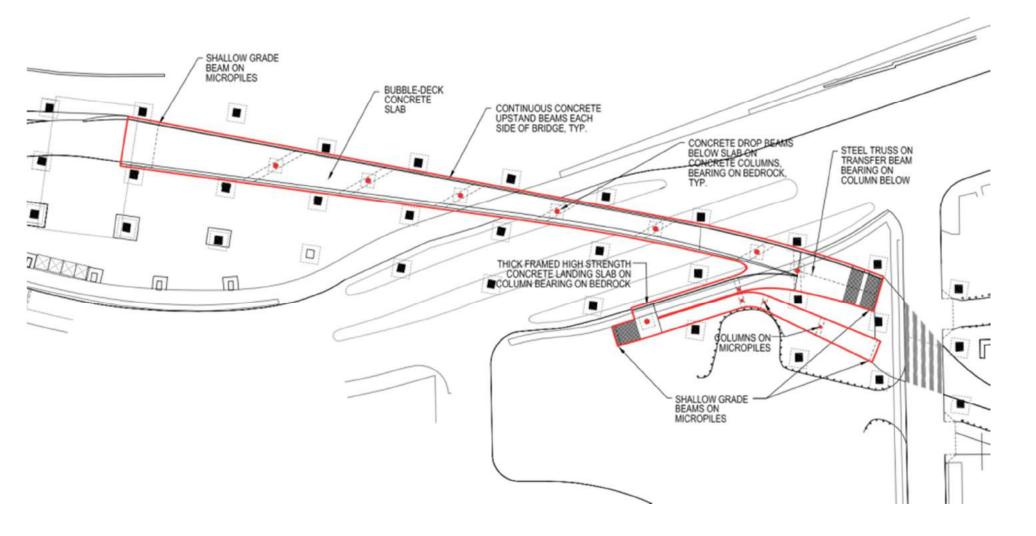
Plan View alternative Design 2 - Grounded Bridge
